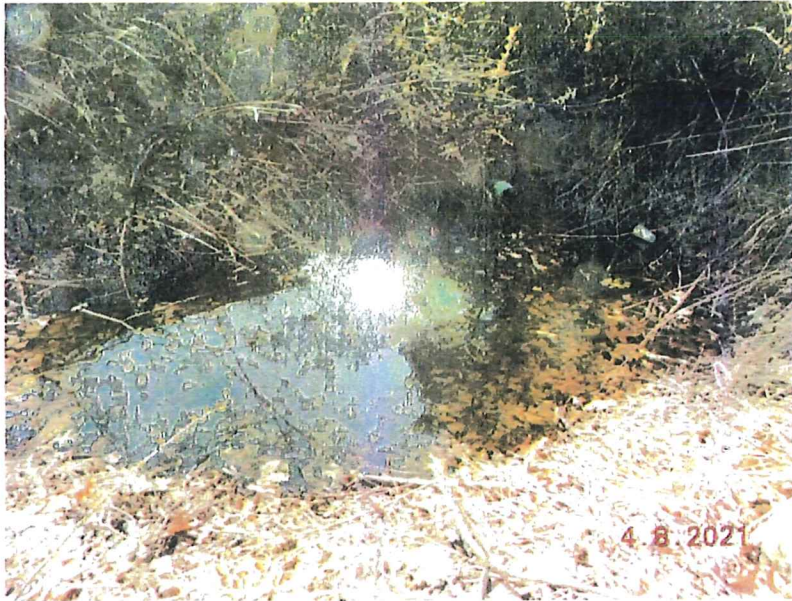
Excavated Area on 217 Cocasset St. showing PVC pipe emanating from 227 Cocasset Street. Looking southeast from 217 Cocasset Street.
